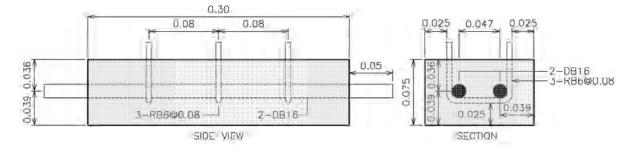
Drawings of specimen & arrangement of reinforcement (Unit: meters).
